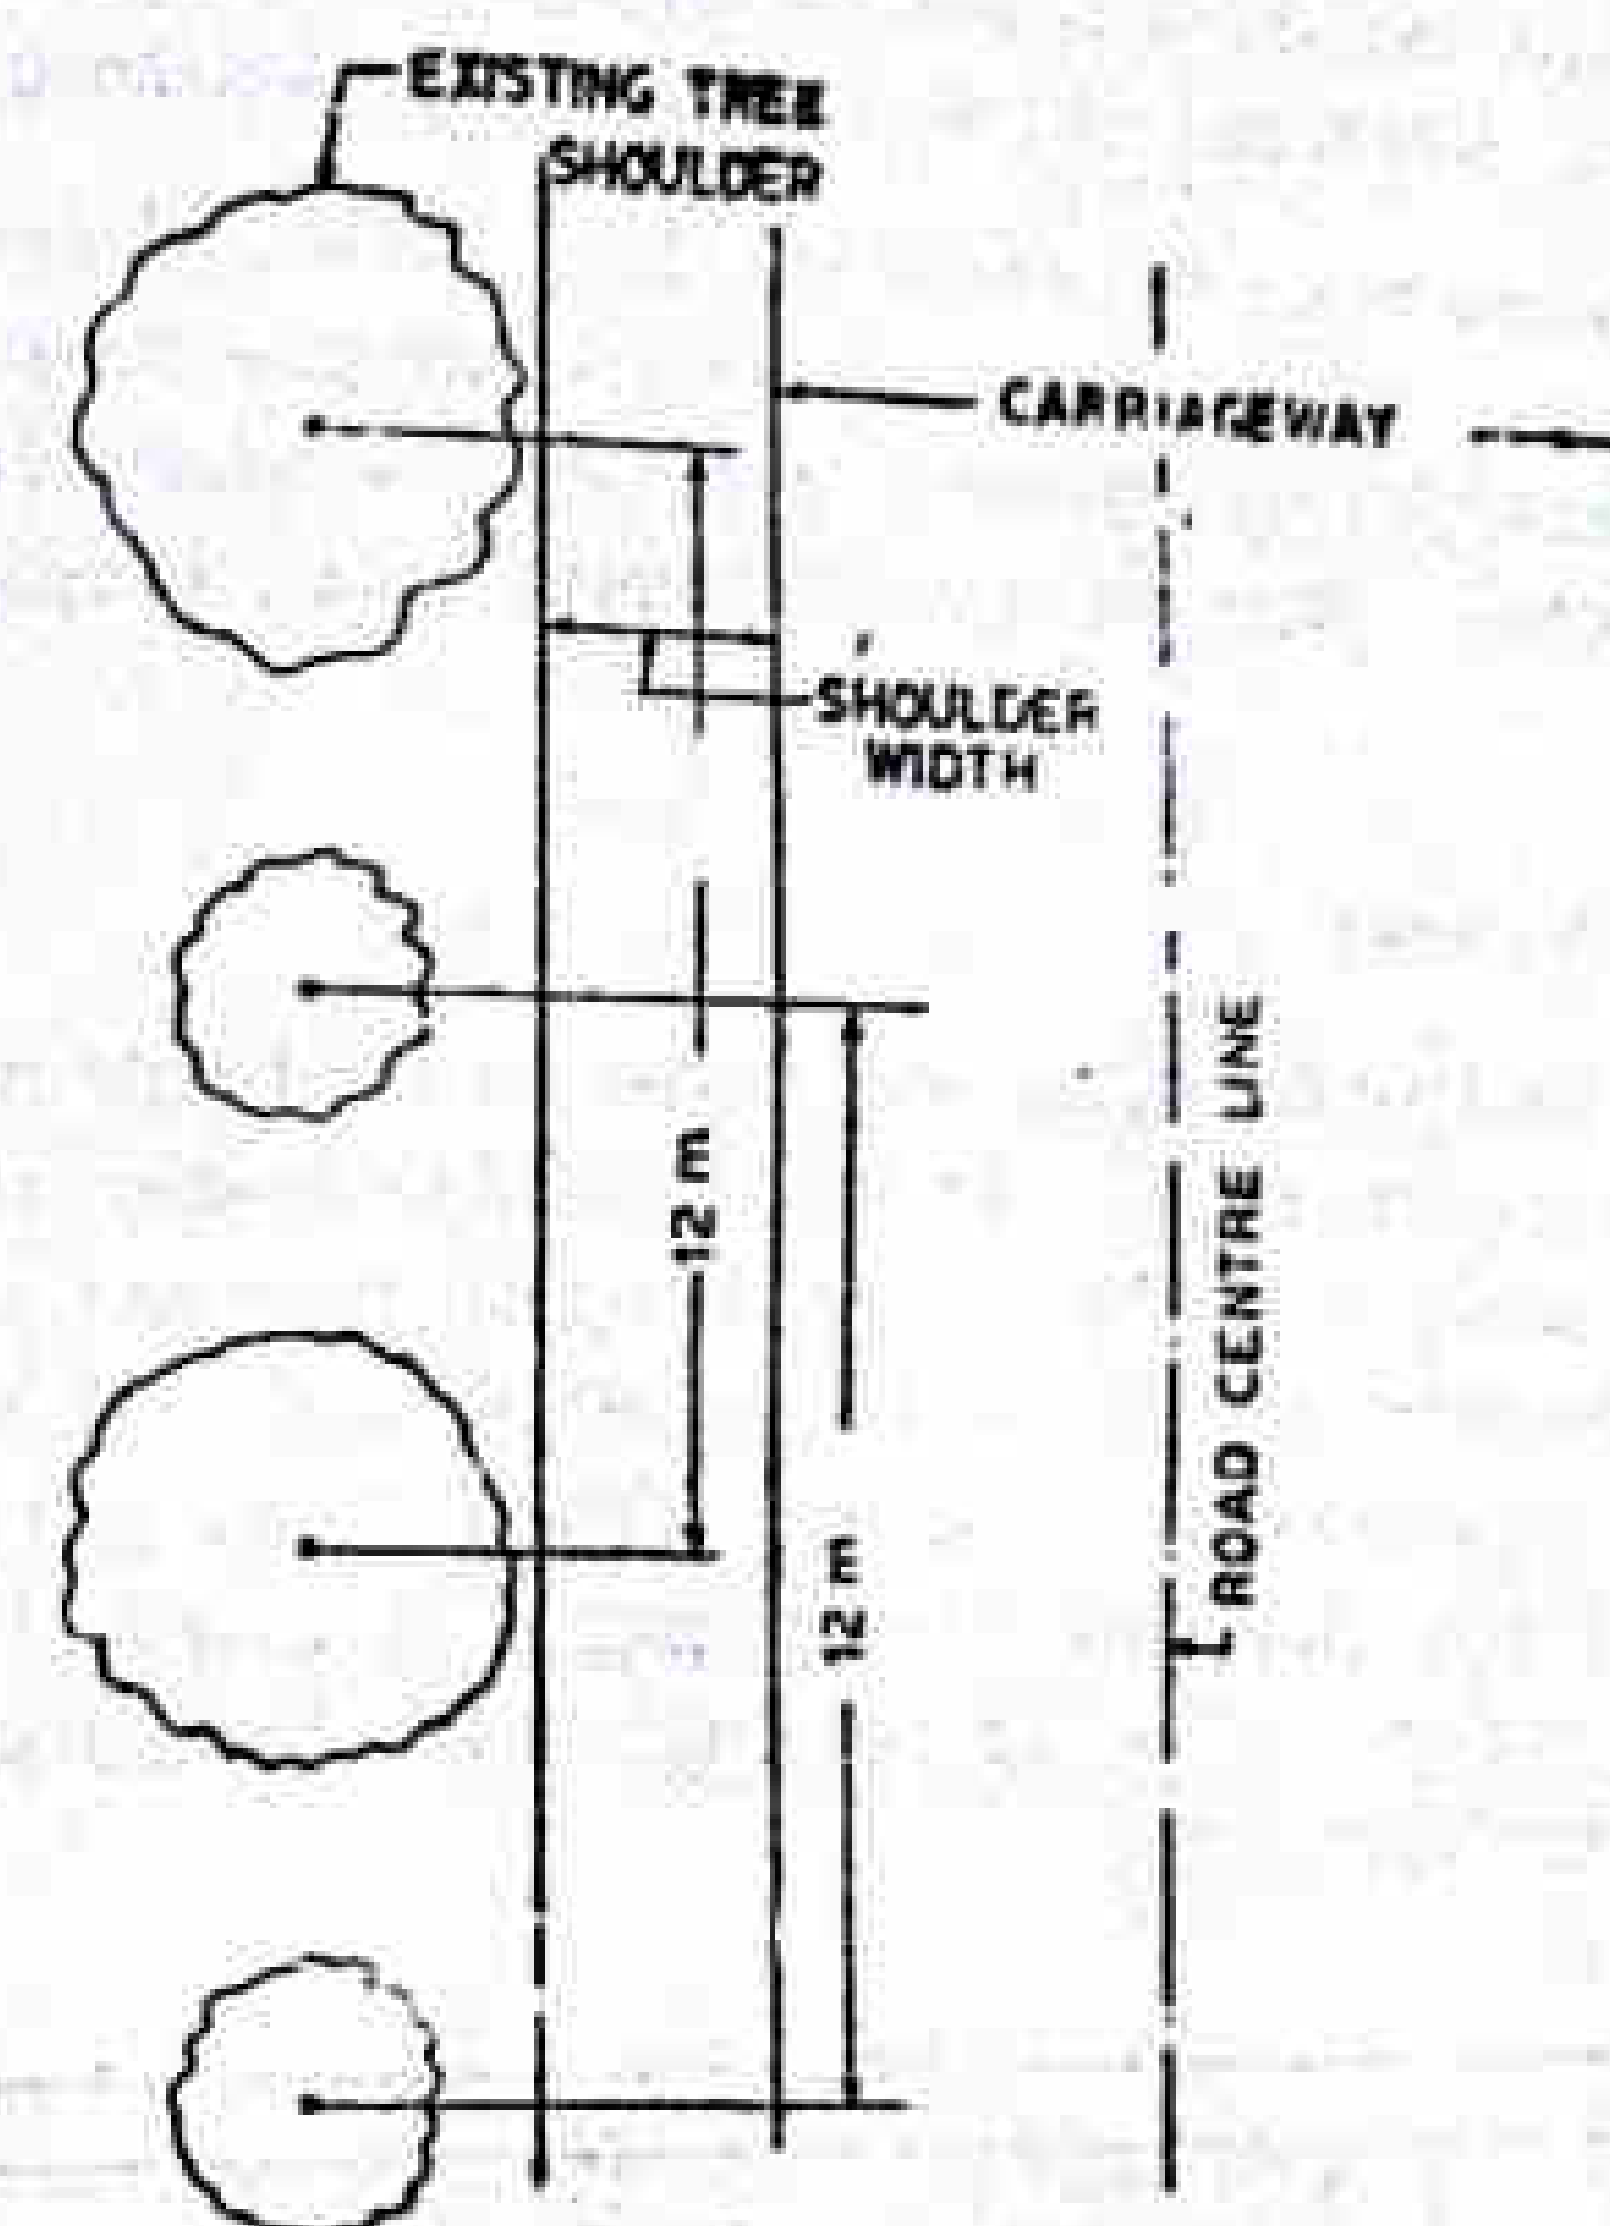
Arrangement of Roadside Trees and Renovation
